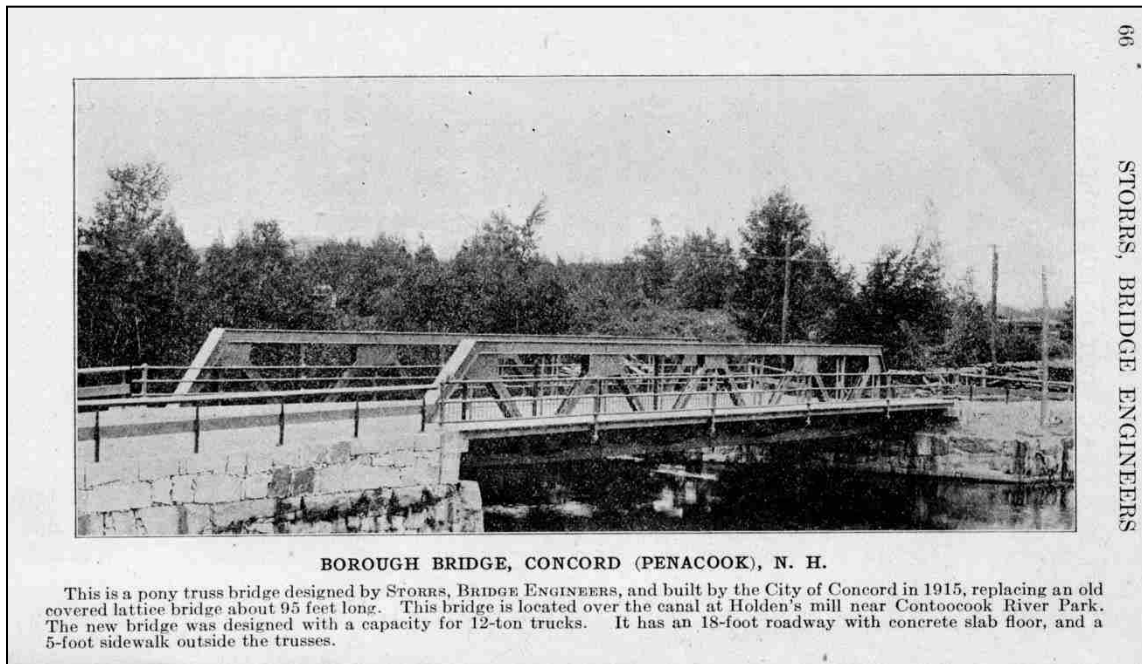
Borough Bridge, 1915 (Storrs & Storrs 1918).
